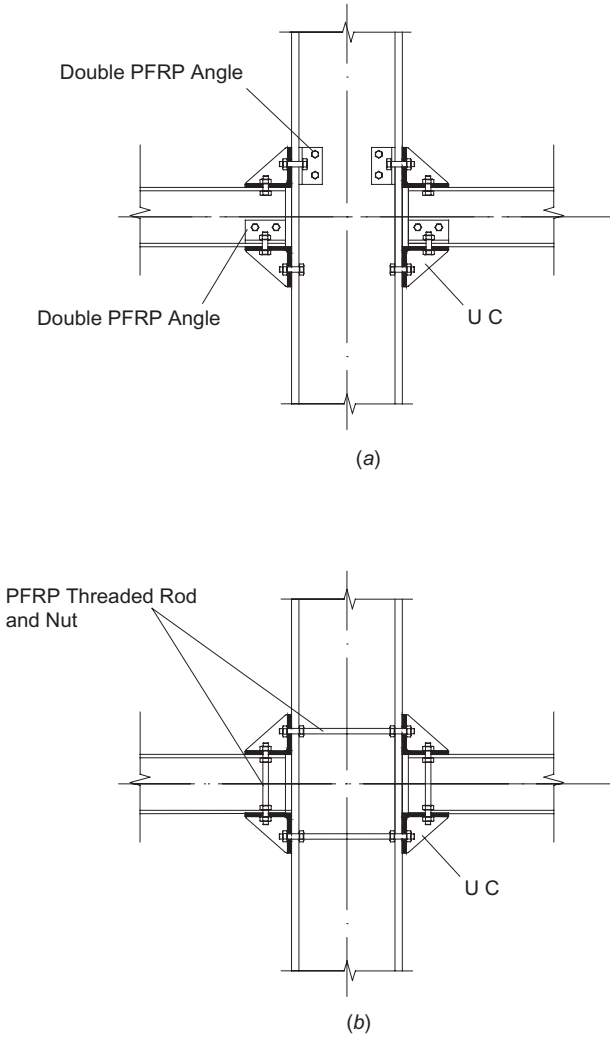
Rigid and semi-rigid PFRP beam-to-column connection details.
